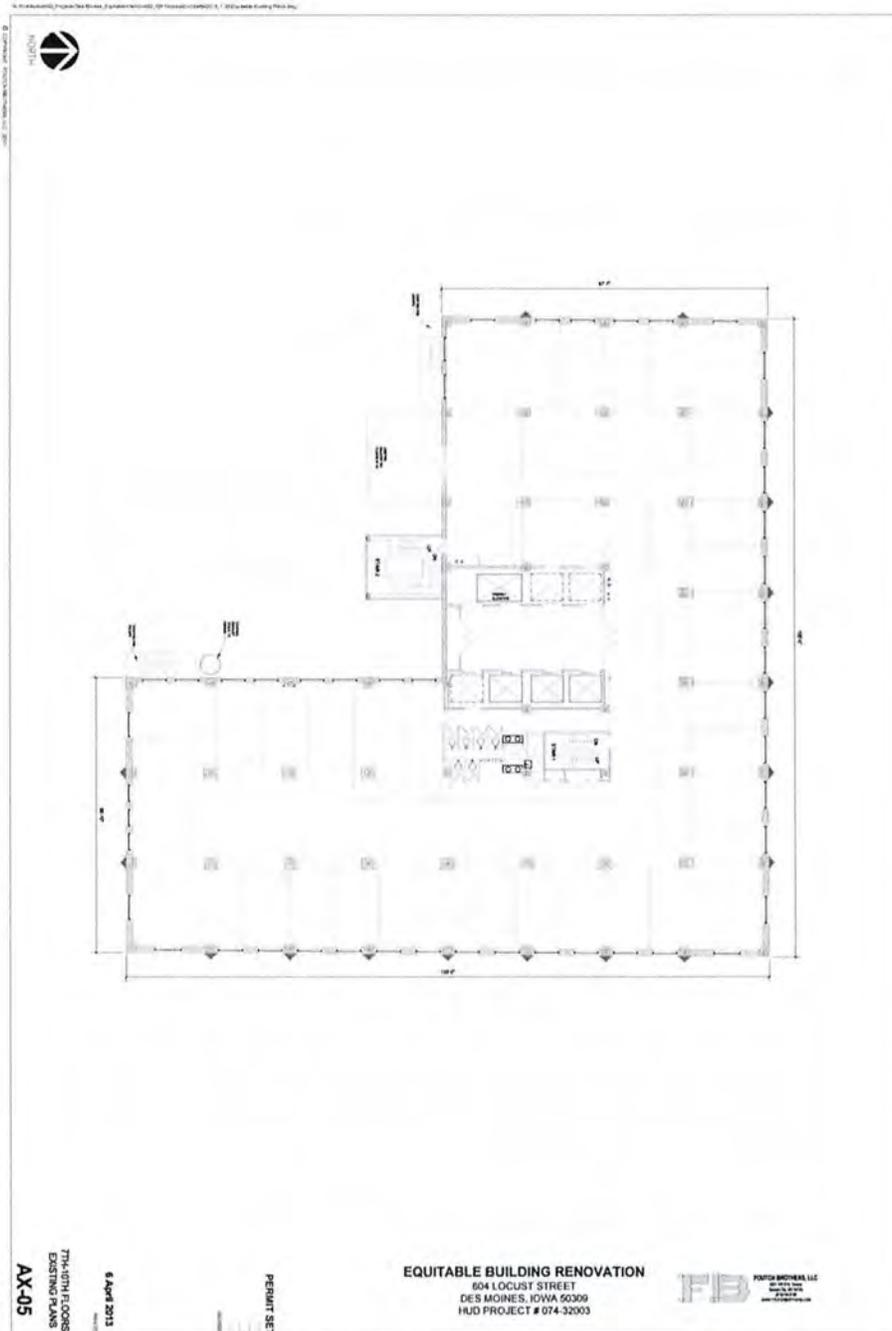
Typical 7th-10th Floors Existing Plans, drawn by Fouch Brothers, LLC from field measurements. Interior partition walls vary from floor to floor, refer to building description for more detail
